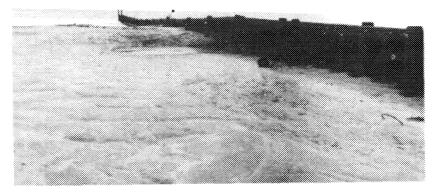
HAMMONASSET BEACH, MADISON. May 6, 1955. East training wall at Toms Creek completed prior to beach widening.
